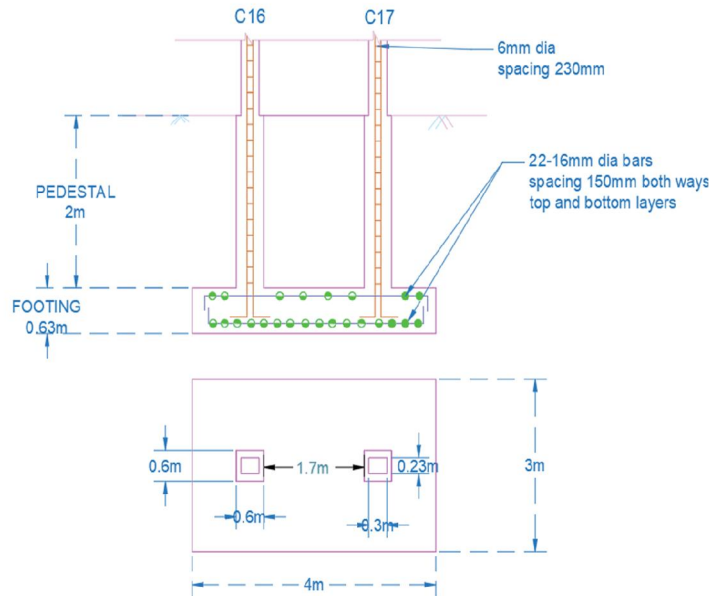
(B) Isolated footing reinforcement(STAADPRO).
